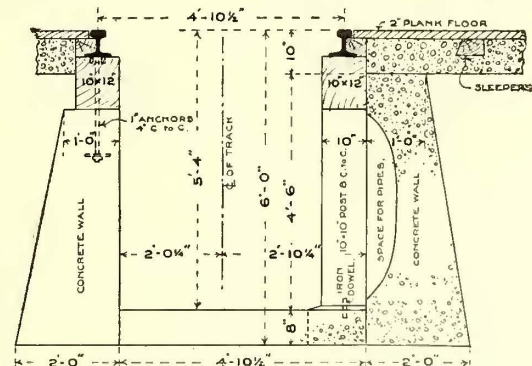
Pit Construction, Deeper than Generally Used, and Probably More Expensive to Construct
